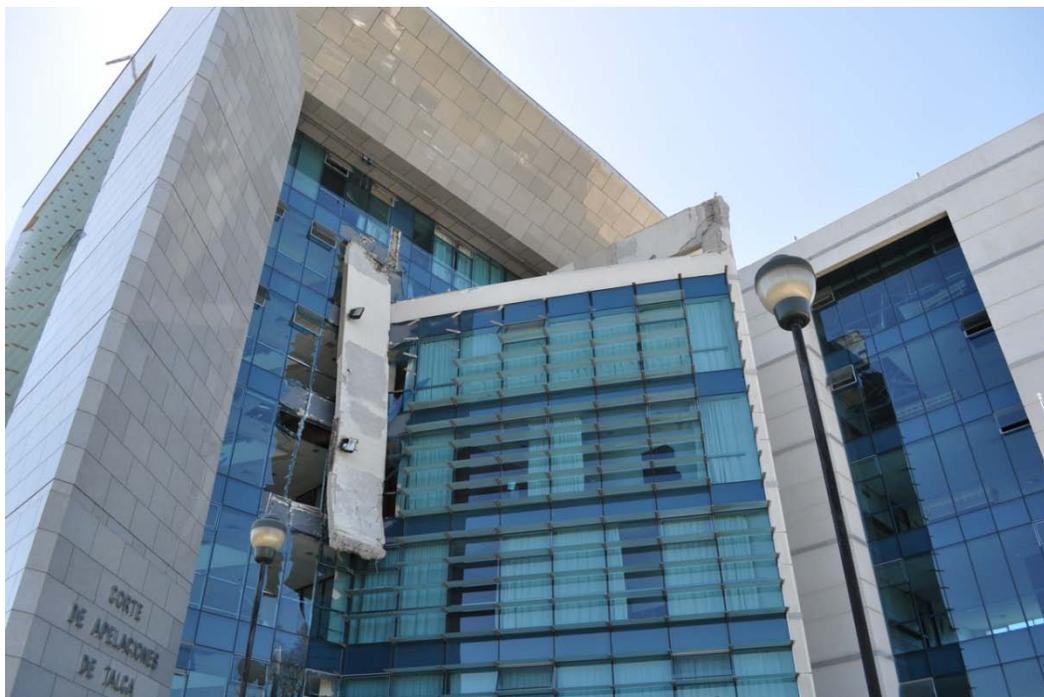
Reinforced concrete appendage dangling from connection on one side; impact damaged the curtain wall and created a serious hazard above the entrance of the Corte de Apelaciones de Talca in the 2010 magnitude-8.8 Chile Earthquake (Photo courtesy of Eduardo Fierro, BFP Engineers).
